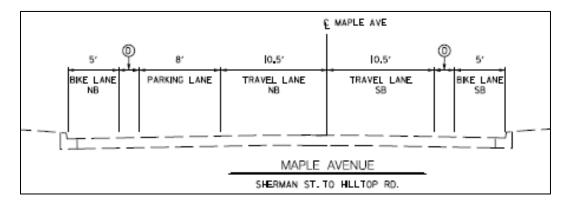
Typical Section - Sherman Avenue to Hilltop Road/ Sligo Creek Parkway
